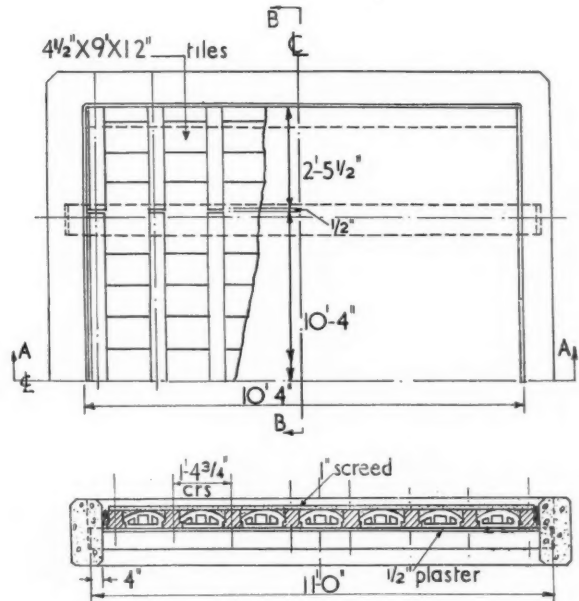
, prestressed (pre-tensioned) concrete floor that has successfully withstood 2-hr. fire test. Right, plan and section A-A; above, half-section B-B.
